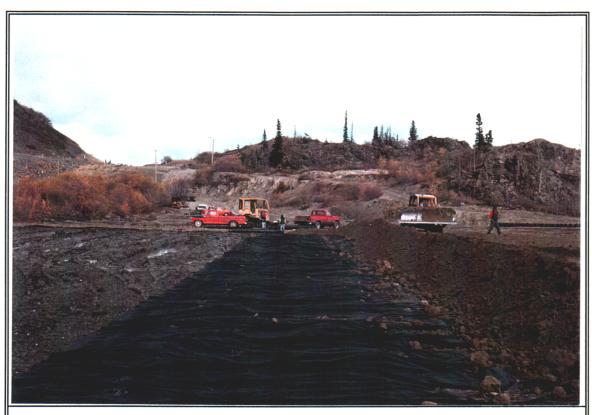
Placing Wind Blown Tailings onto Tailings Area.
